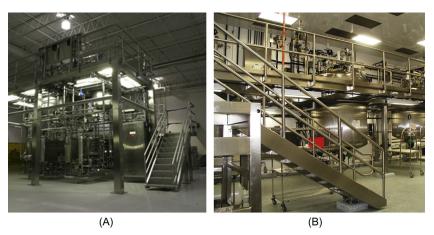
(A) Connecting the framework of stairs, walkways, or platforms to a floor usually occurs by means of a base plate securely fastened to the floor by means of a fixing bolt (courtesy of Holland Applied Technologies). (B) Base plates also can be fixed to a floor plinth, thus prohibiting dirt and liquids from getting under the base plate during process and cleaning operations. The stringers of staircases make no floor contact, hence facilitating the cleaning of the factory floor. Photo left, courtesy of Holland Applied Technologies; photo right, courtesy of Bay State Industrial Welding & Fabrication, Inc.)
